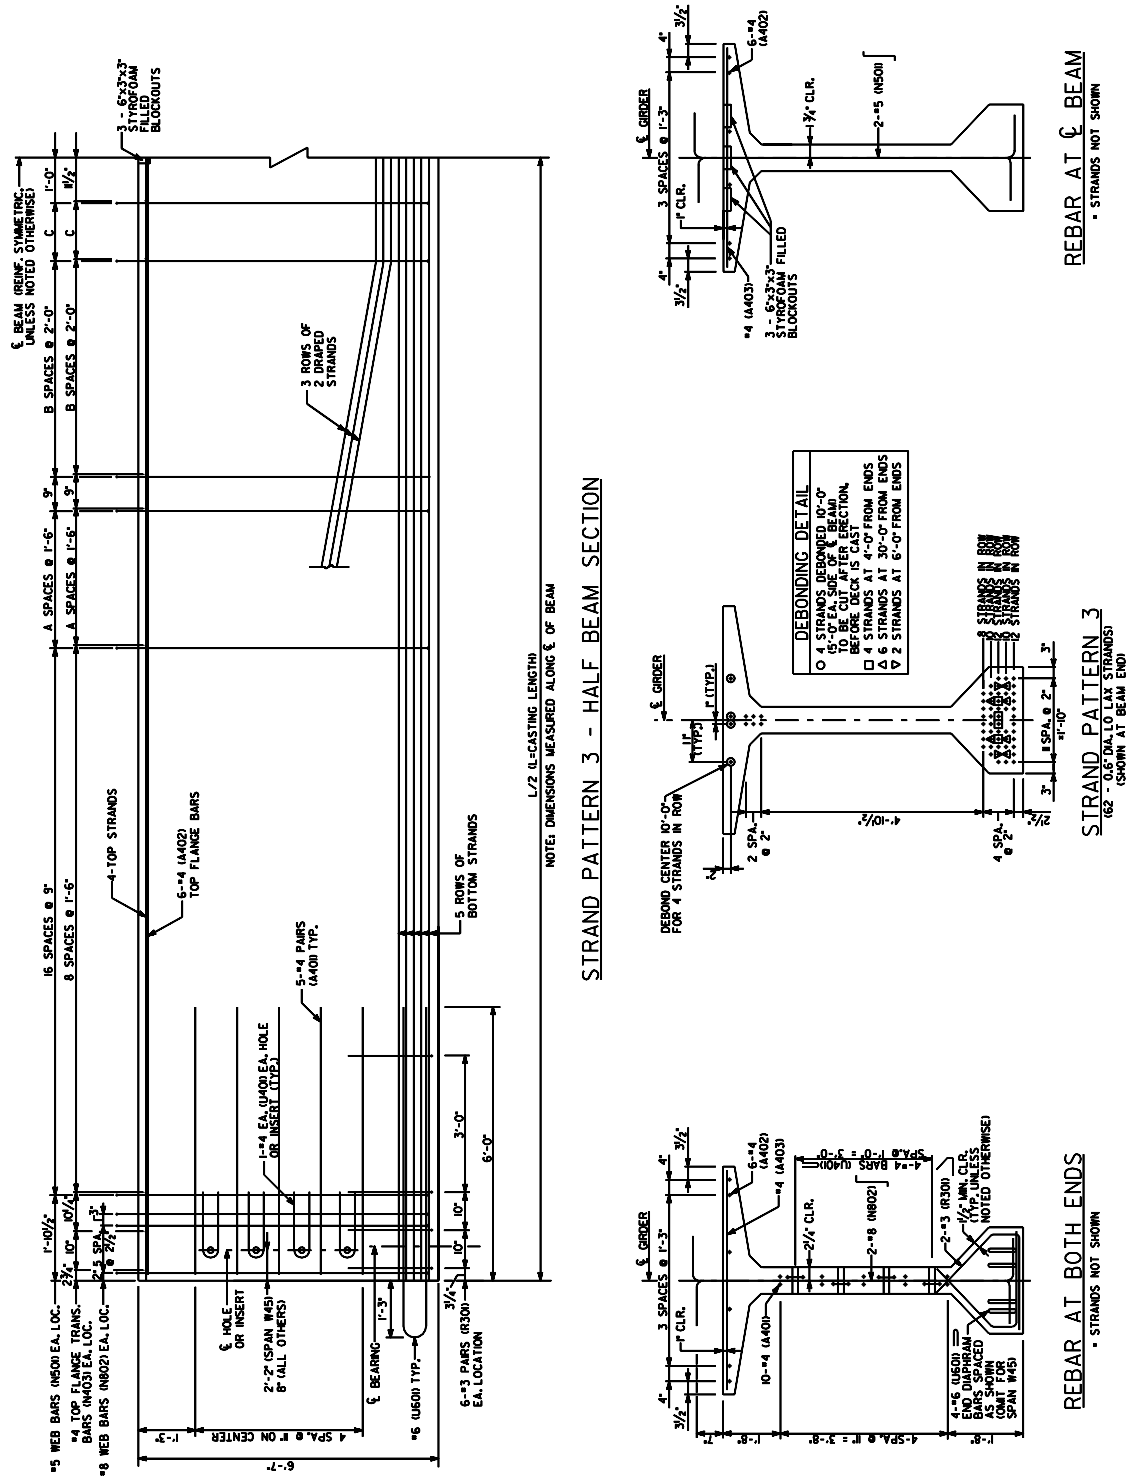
Strand Pattern 3 Beam (56 Straight Strands, 6 Draped Strands)
